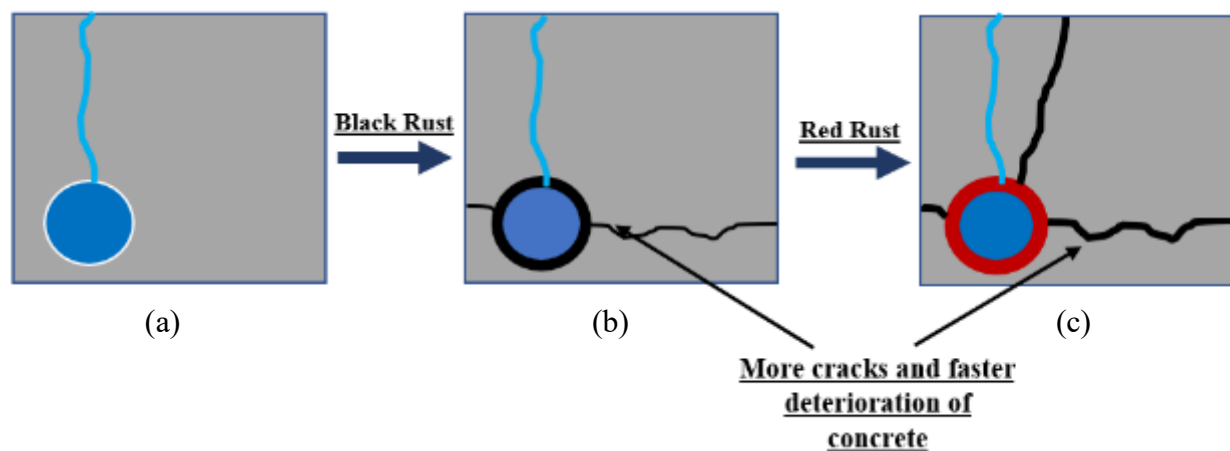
shows the stages of concrete deterioration due to corrosion from external chemicals penetrating through cracks. (a) External chemicals reaching the rebar through crack (b) black rust forms causing additional cracks (c) red rust forms leading to increased cracks and concrete deterioration.
